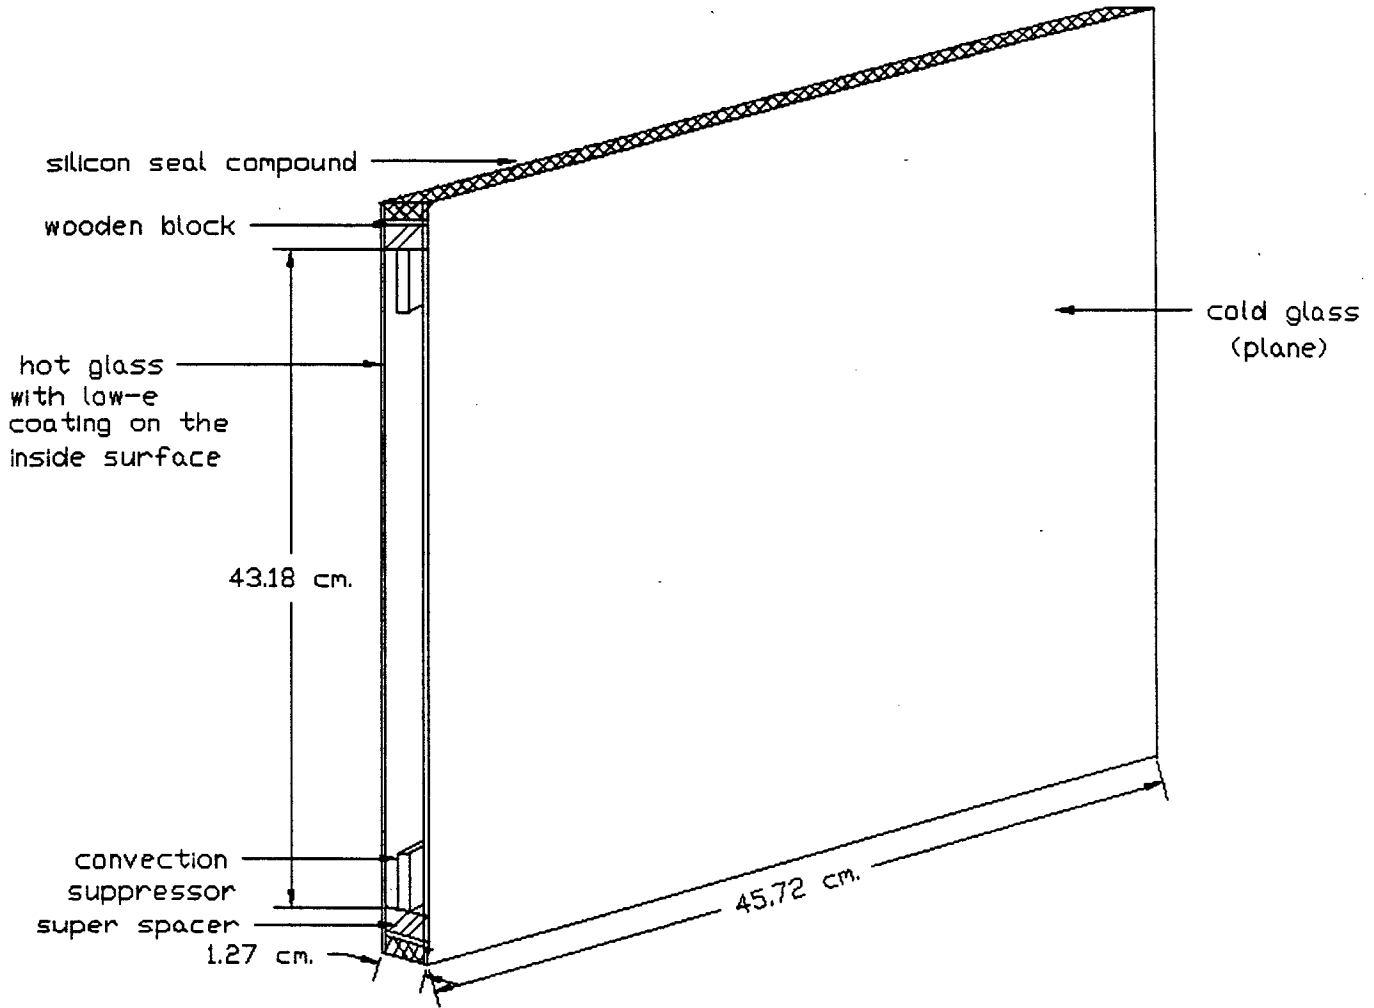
Double Window Glazing Assembly With Convection Suppressor
